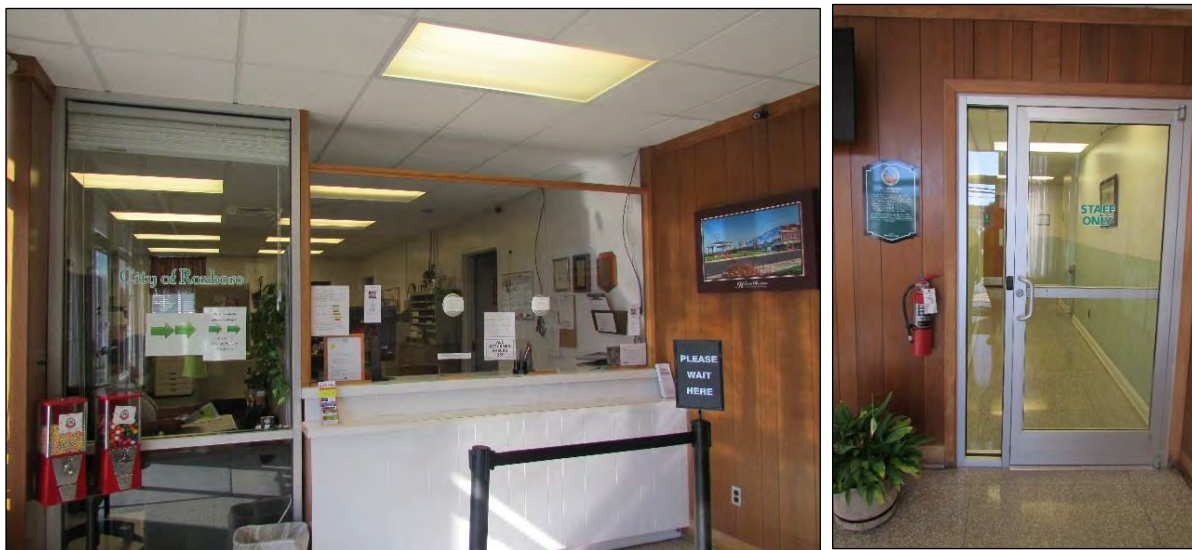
Interior of Customer Entrance off of S. Lamar Street (Left), Looking Southwest and Recently Added Interior Security Door (Right), Looking Northwest.
